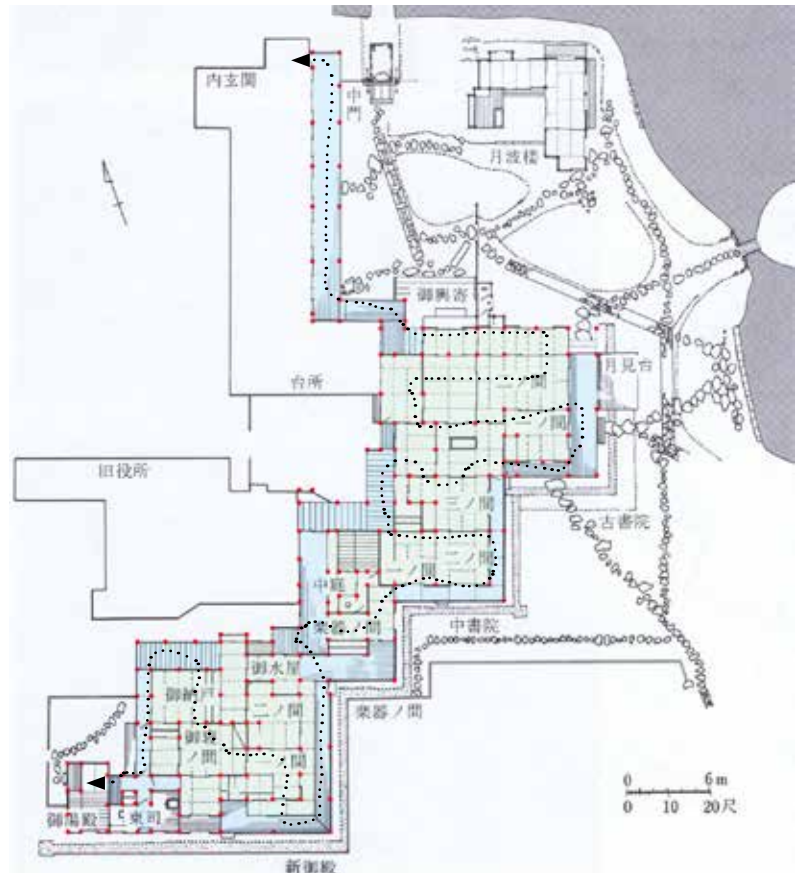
A plan view of Katsurari-kyu composed of pillars, corridors and rooms
